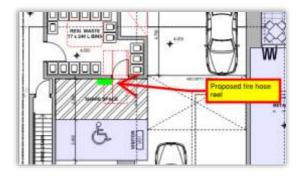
Proposed fire hose reel location (ground floor carpark)
